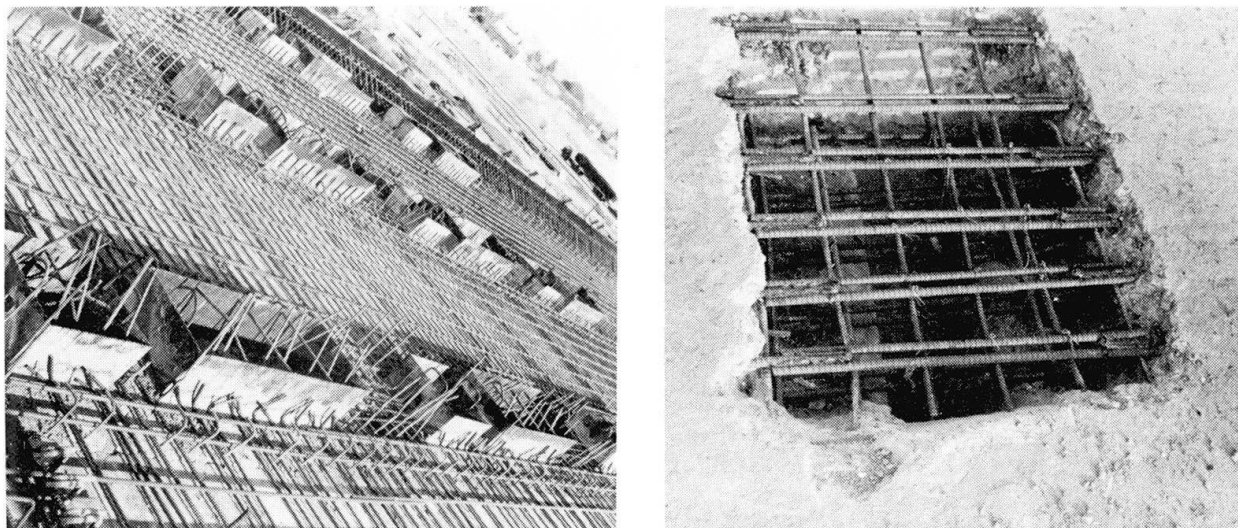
Reinforcement affected by anchoring of cable in the deck
